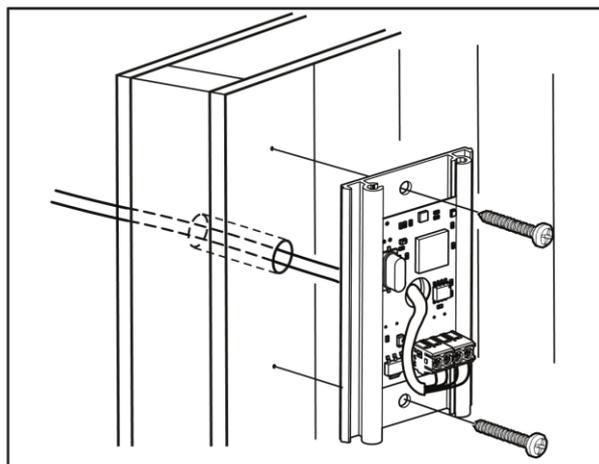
B: Wiring through the wall. The example shows the sensor for Combi Elite. Connect the sensor cable (see Figure 18).
